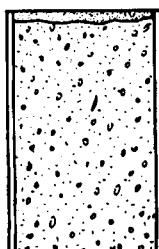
Levelling off the inadequately concrete filled ends of a hollow section column by mortars
